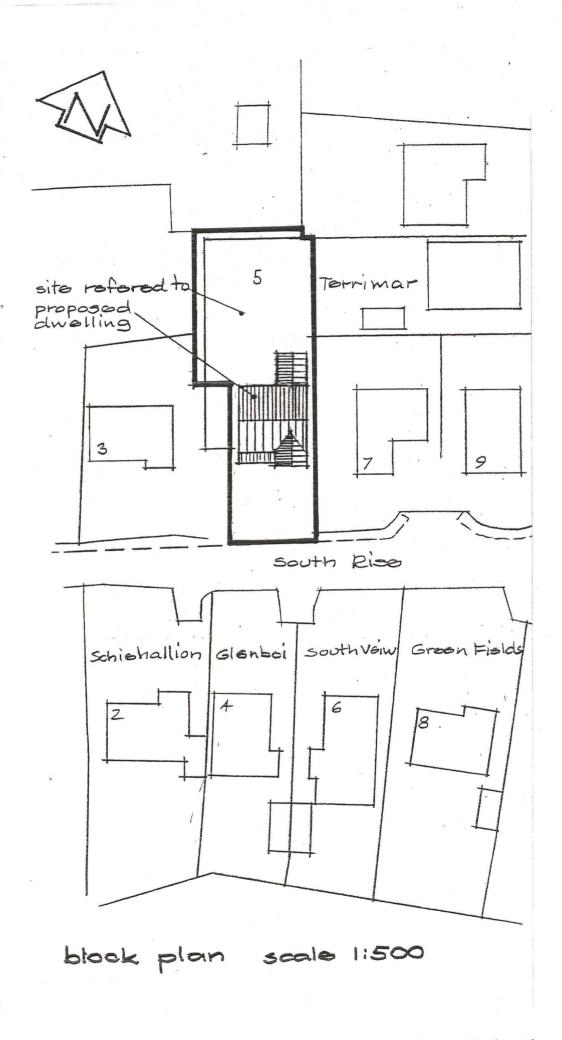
Plot nos.2 - 9, South Rise, Binbrook: Existing block plan layout. (Architect's Plan, scale 1:500).
